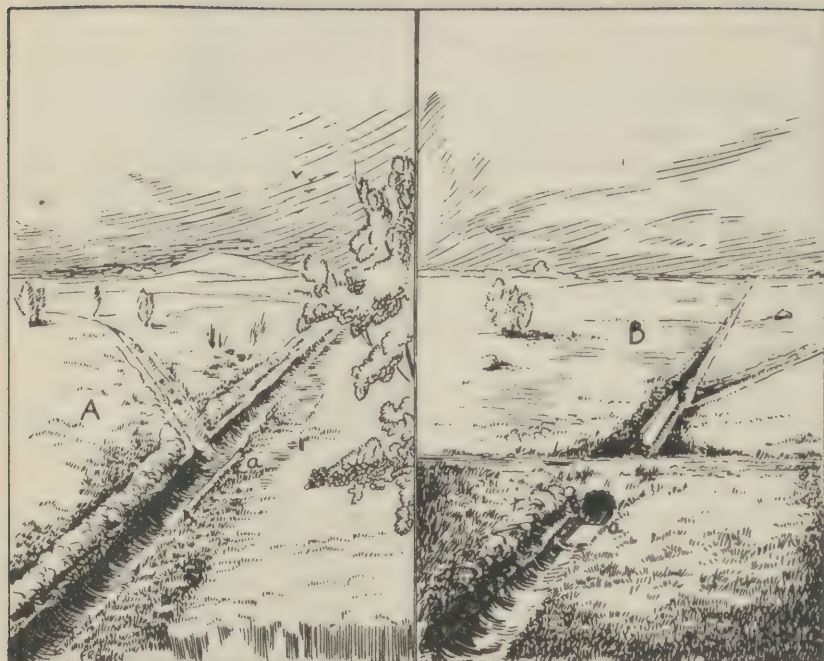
Drainage ditches. A—Showing (a) splash board for ditch junction. B—Showing splash board at ditch junction and culvert under roadway, with concrete slab (a) at down stream end of culvert.
